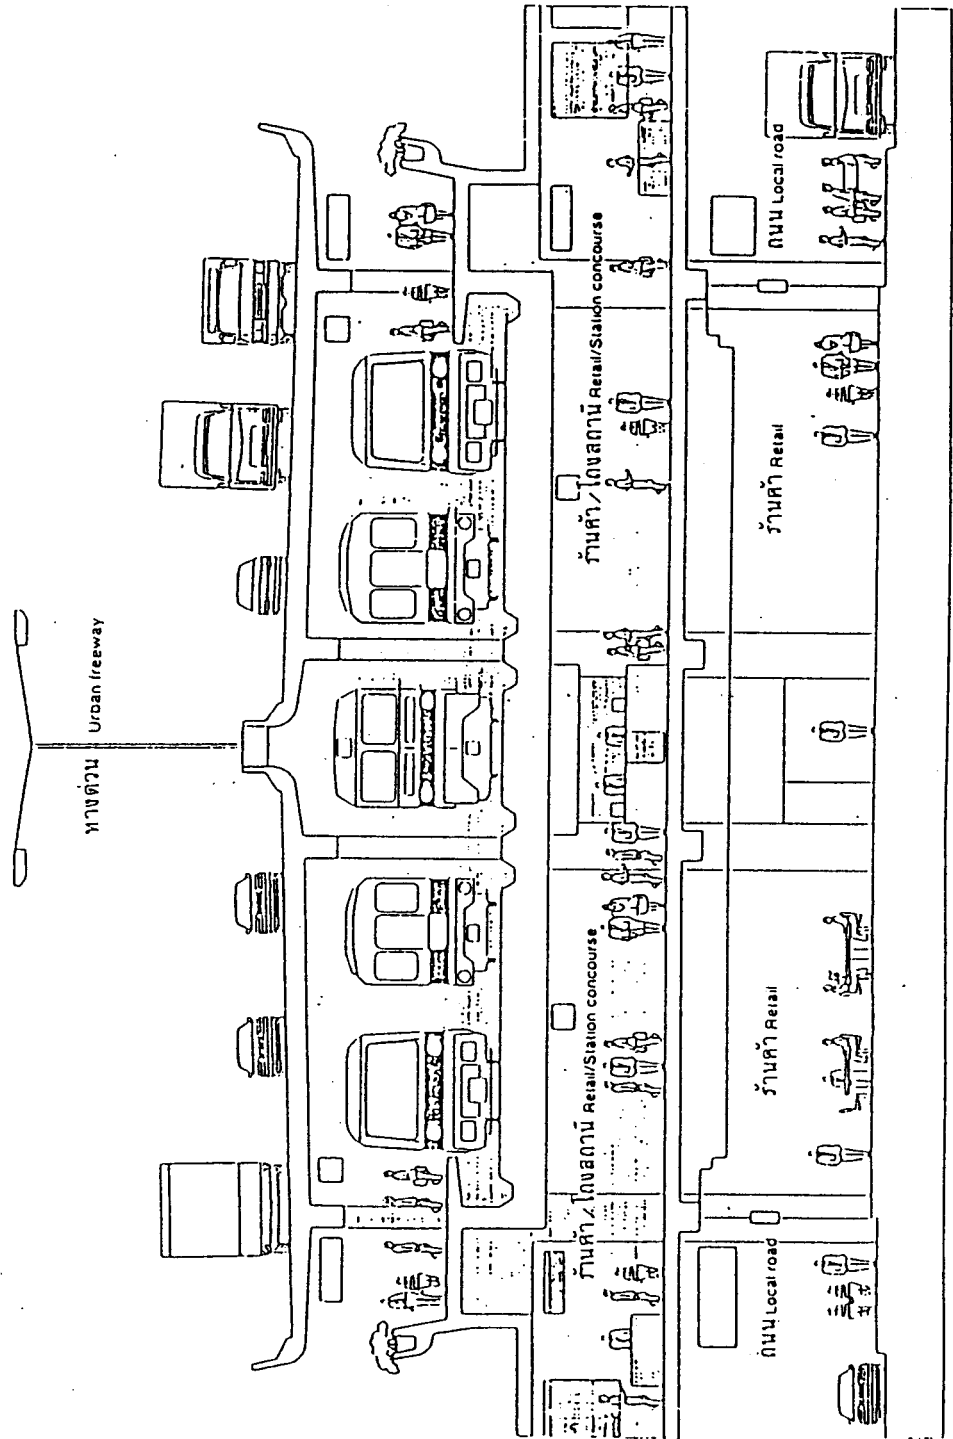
SECTION THROUGH RAMTUF'S TYPICAL STATION
